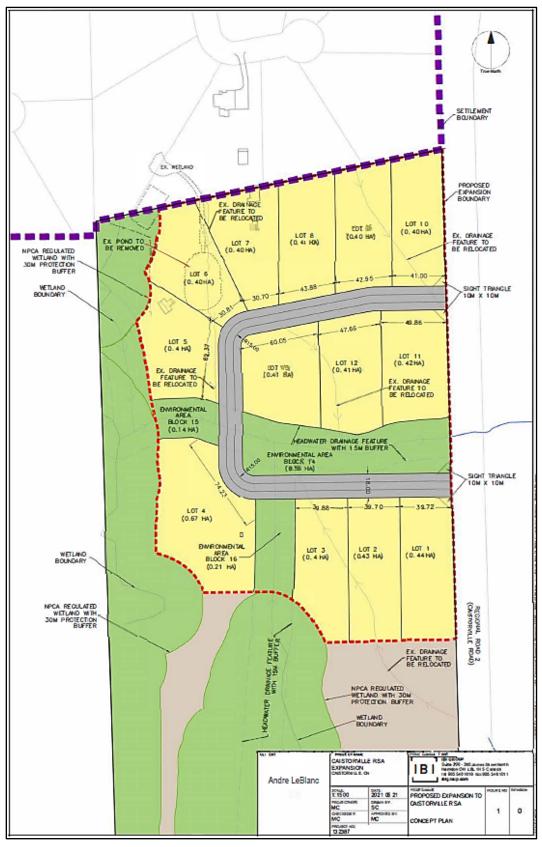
Conceptual Development Plan Within Proposed RSA Expansion Area
